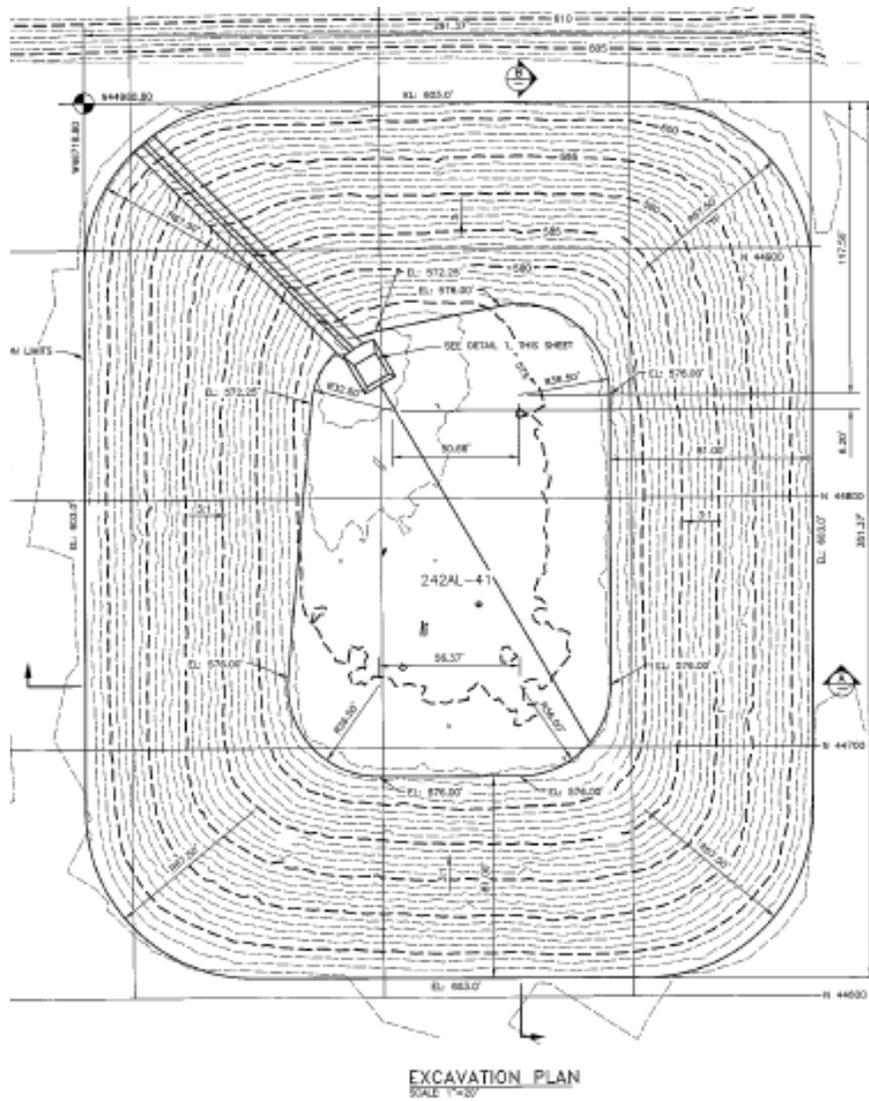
LERF Basin 41 Civil Excavation Plan (H-2-838748, Sheet 1)
